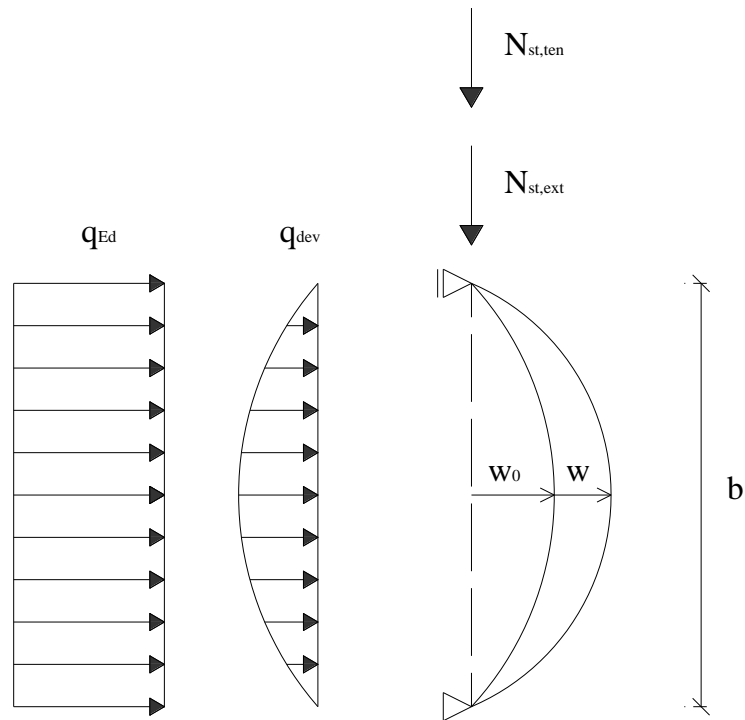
General loading conditions affecting the transverse stiffeners (Johansson et al., 2007)
